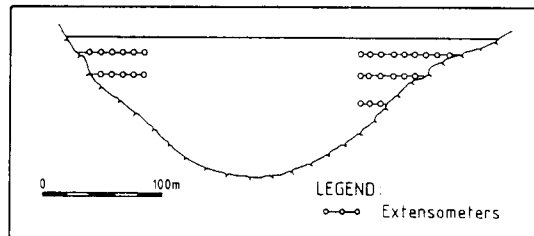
Svartevann Dam. Longitudinal section. Locations of extensometer string.
